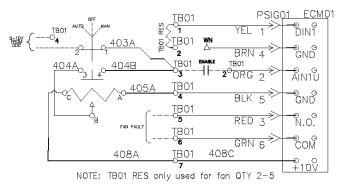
EBM Gen 2 Motor - Control Wiring with No Controls
